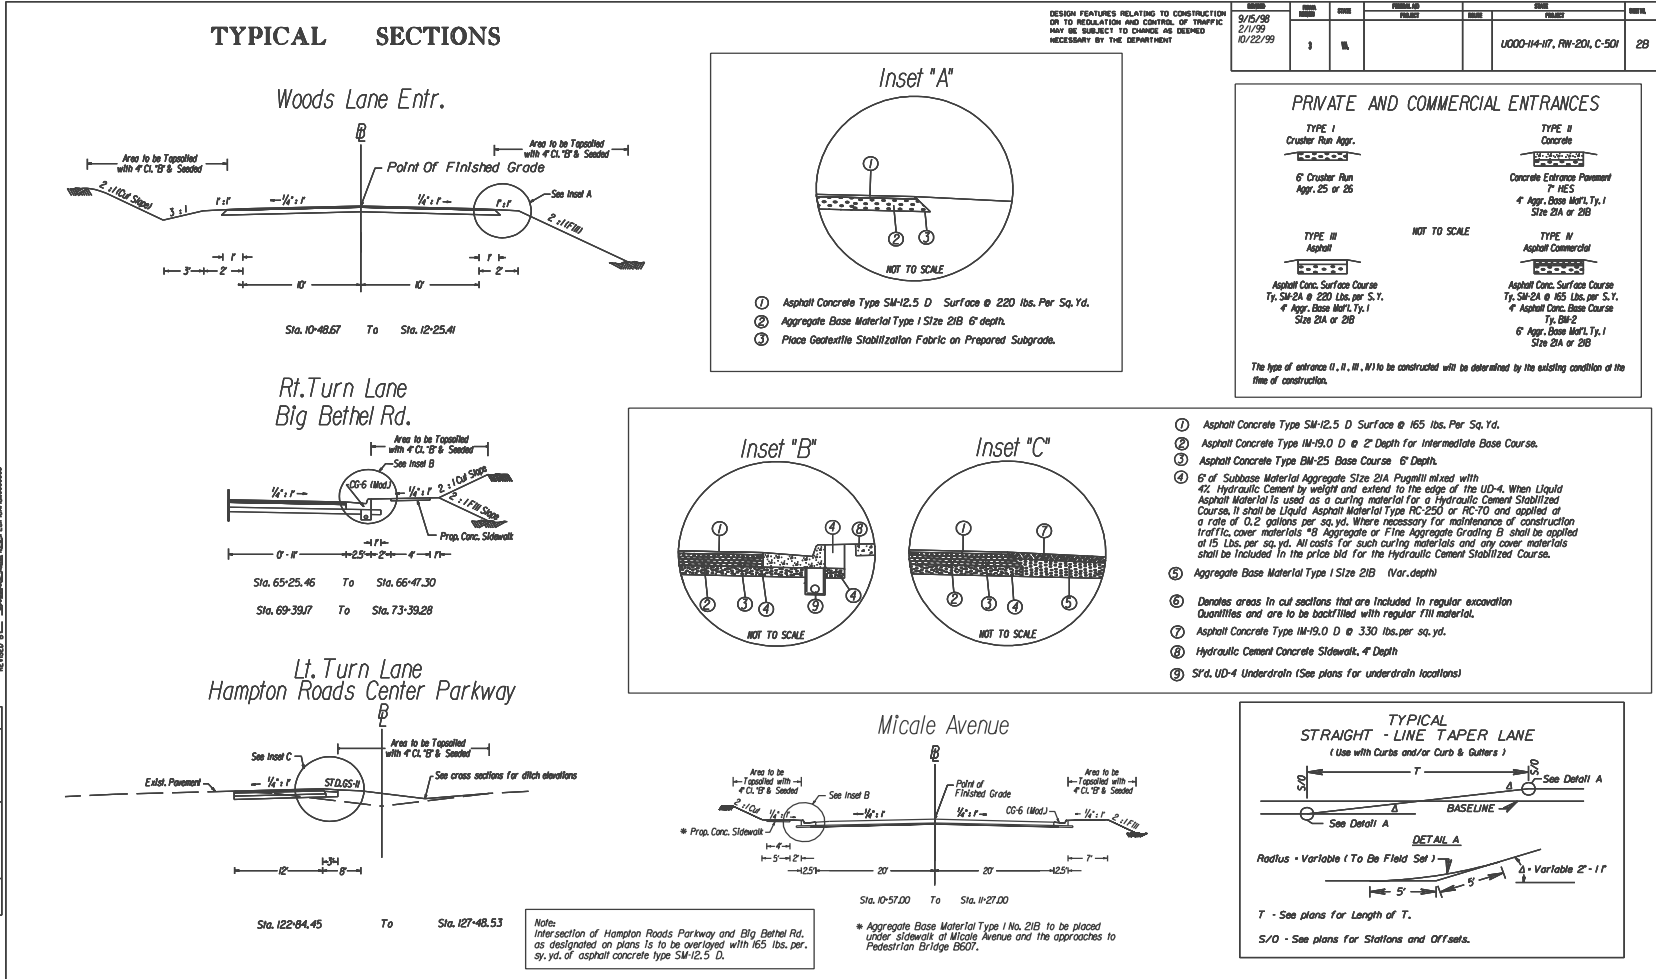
E-18 SAMPLE TYPICAL SECTION SHEET
